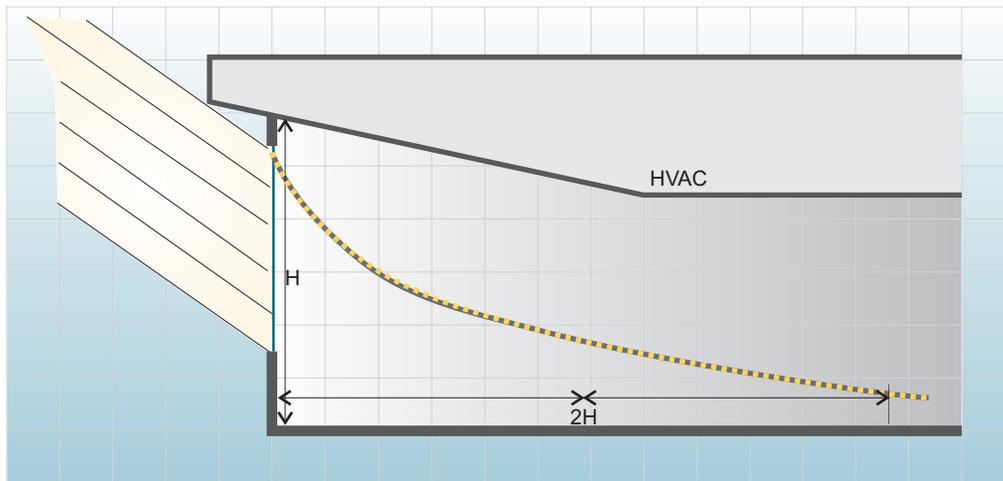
Sidelit Building with Sloped Ceiling at Perimeter
